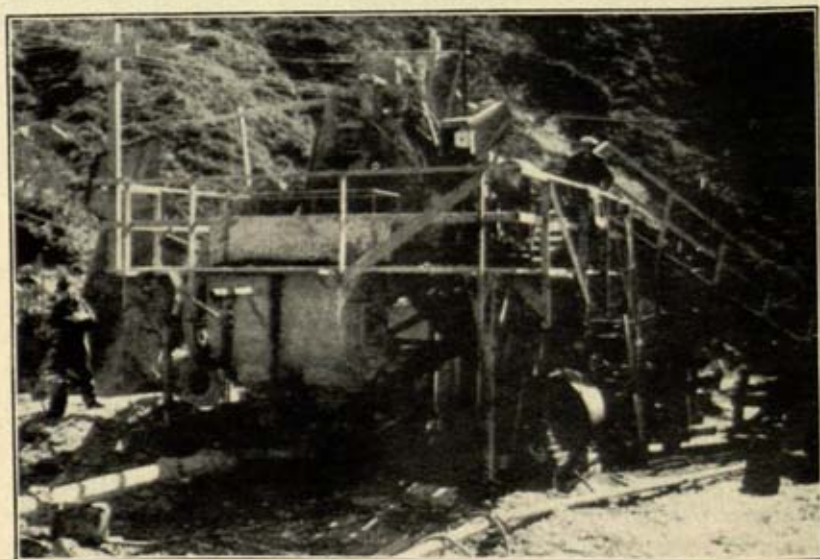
Double Pumperete machine used to line the Gaviota Tunnel. (*Western Construction.*)
